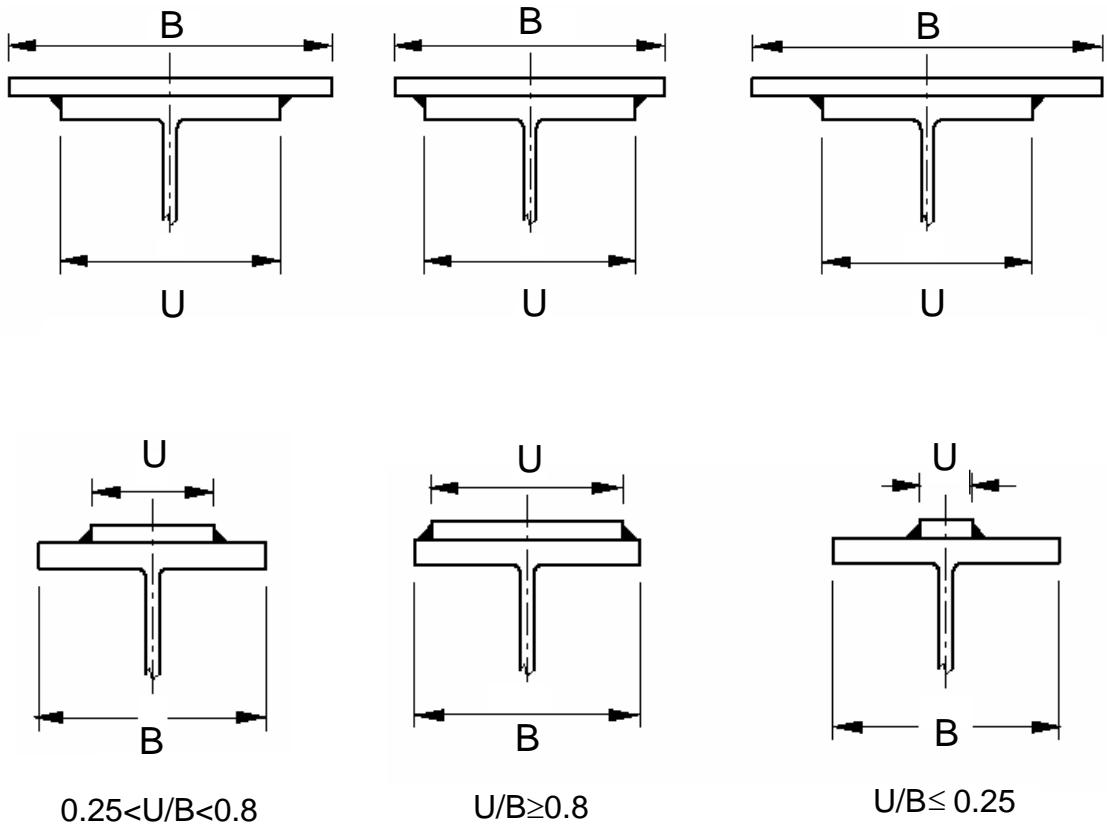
Rolled I- or H-sections with welded flange plates
